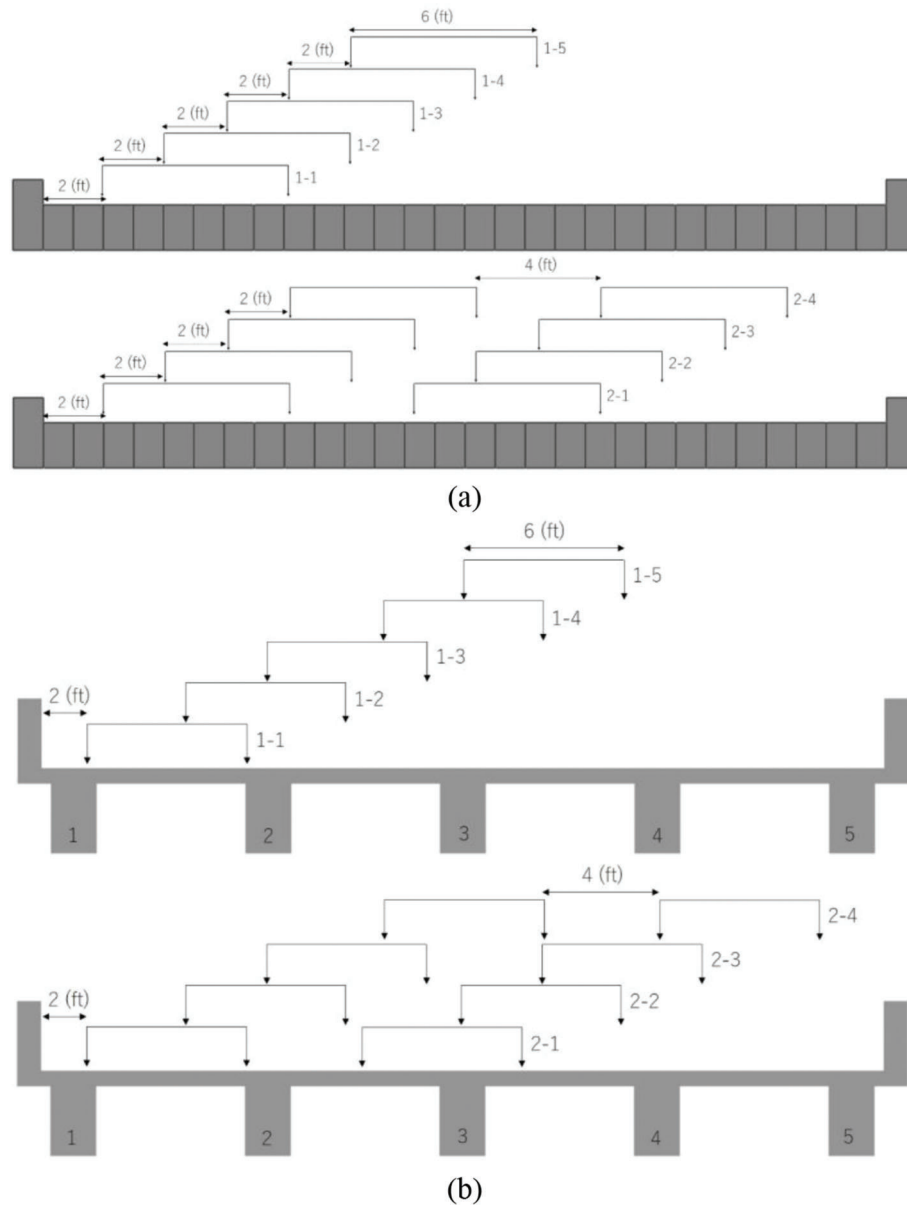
Truck loading configuration: (a) slab and (b) T-beam.
